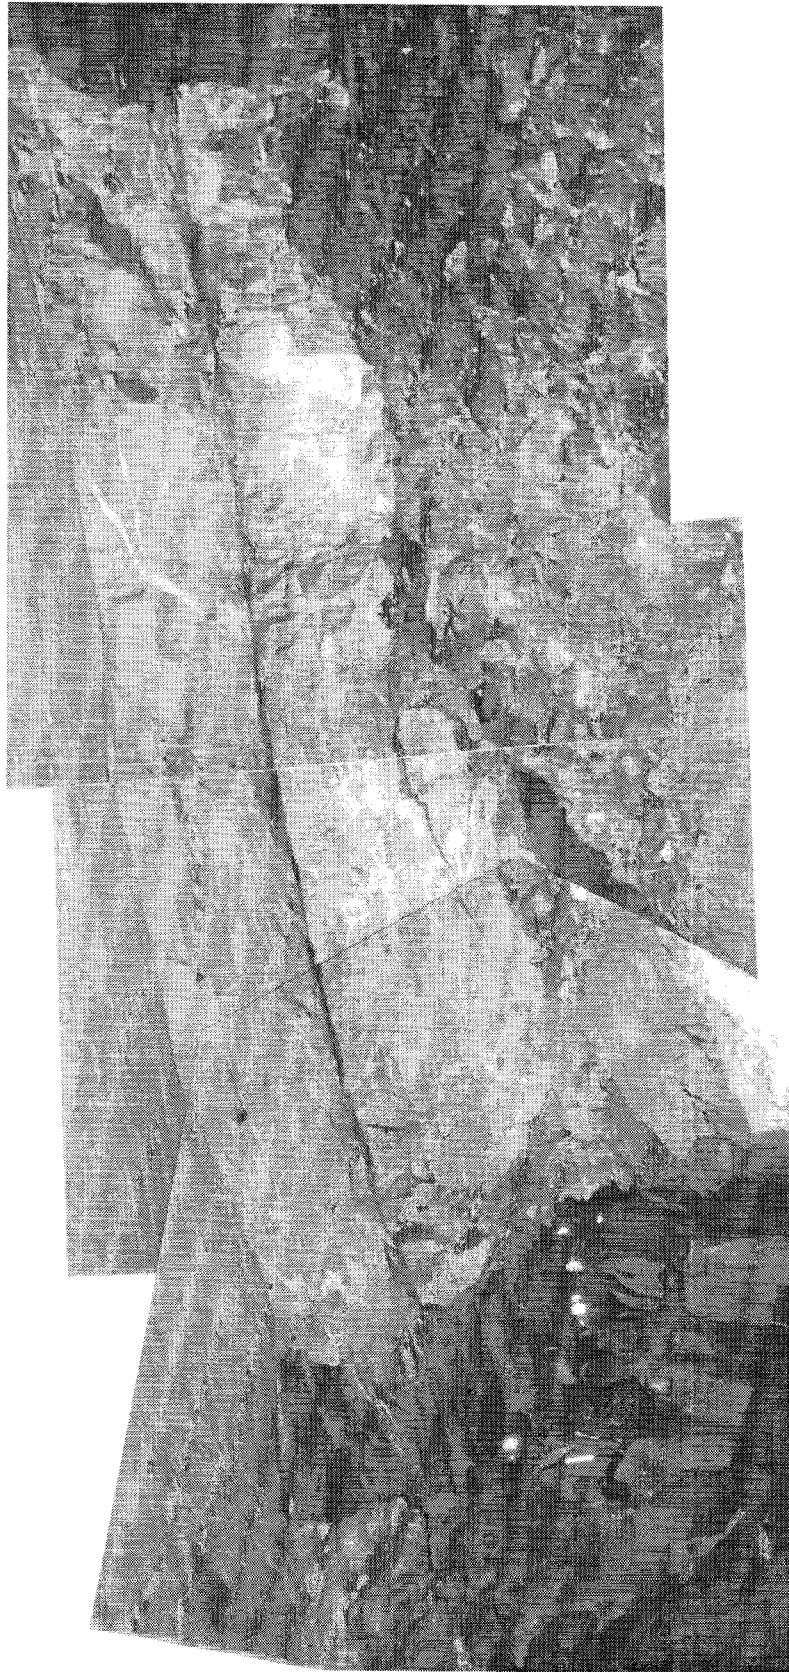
View towards the west of the fall of ground in the 3W strike gully, 36-35 C/L west mini-longwall, West Driefontein No. 6 shaft.
